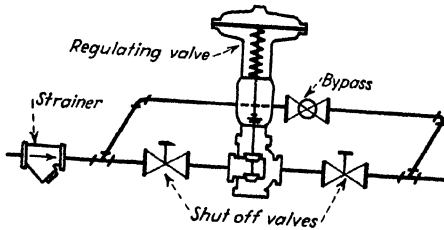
Protect the valve with a strainer and install a by-pass line.
